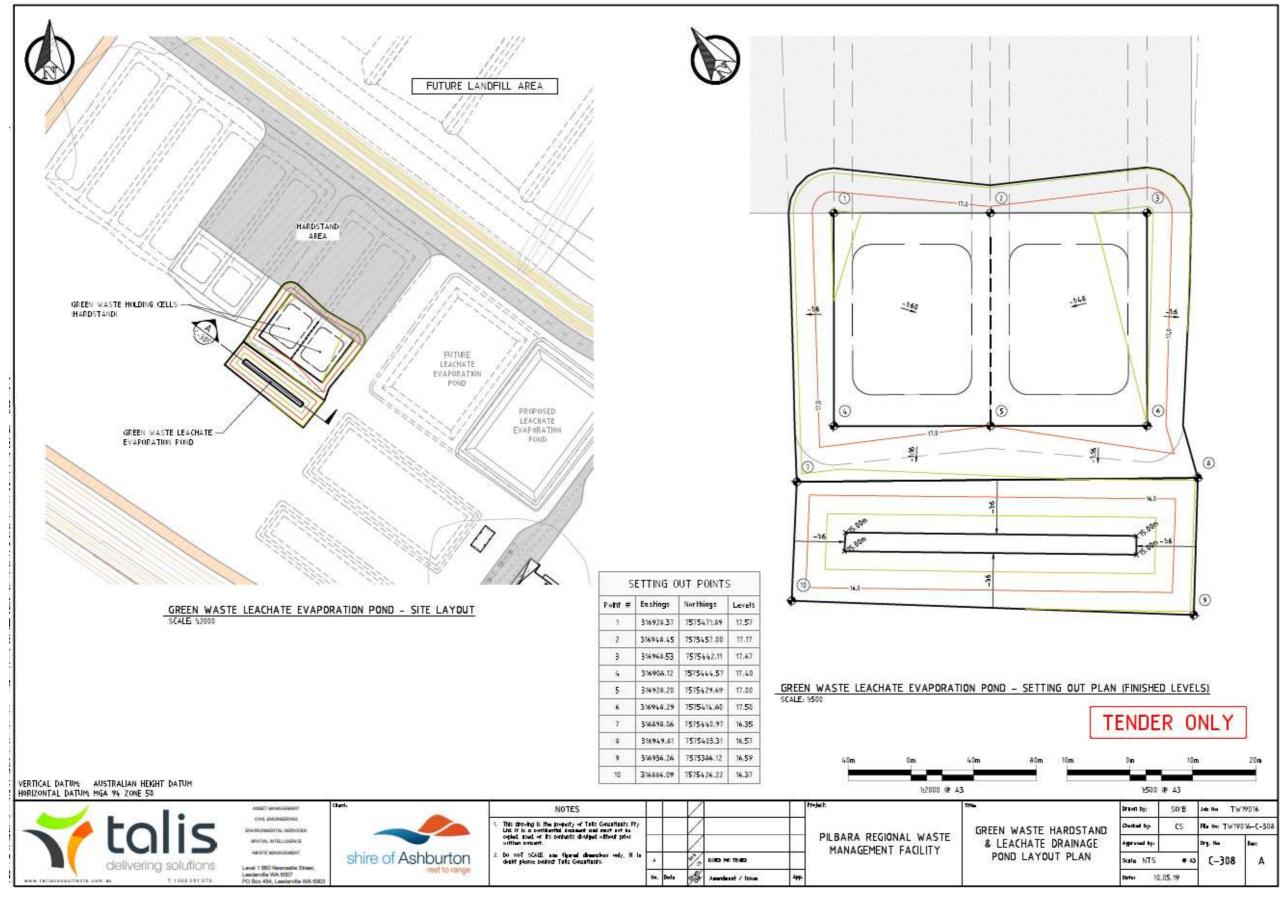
Green waste hardstand and leachate drainage pond layout plan
